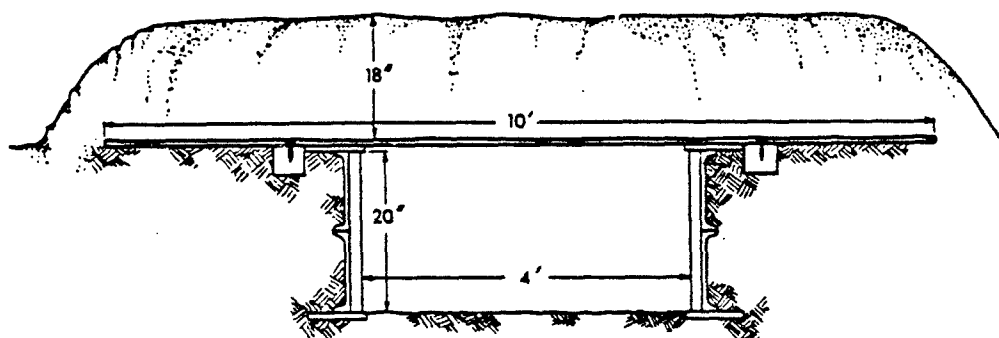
Sketch of Installation of Sheet Steel Closure, Experiment 4170.
